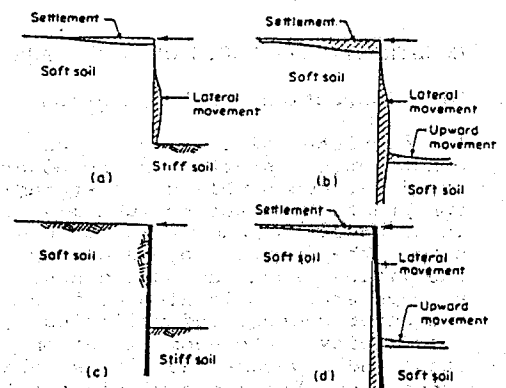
Settlement, Lateral movement and Heave, (a) and (b) flexible wall (c) and (d) rigid wall
